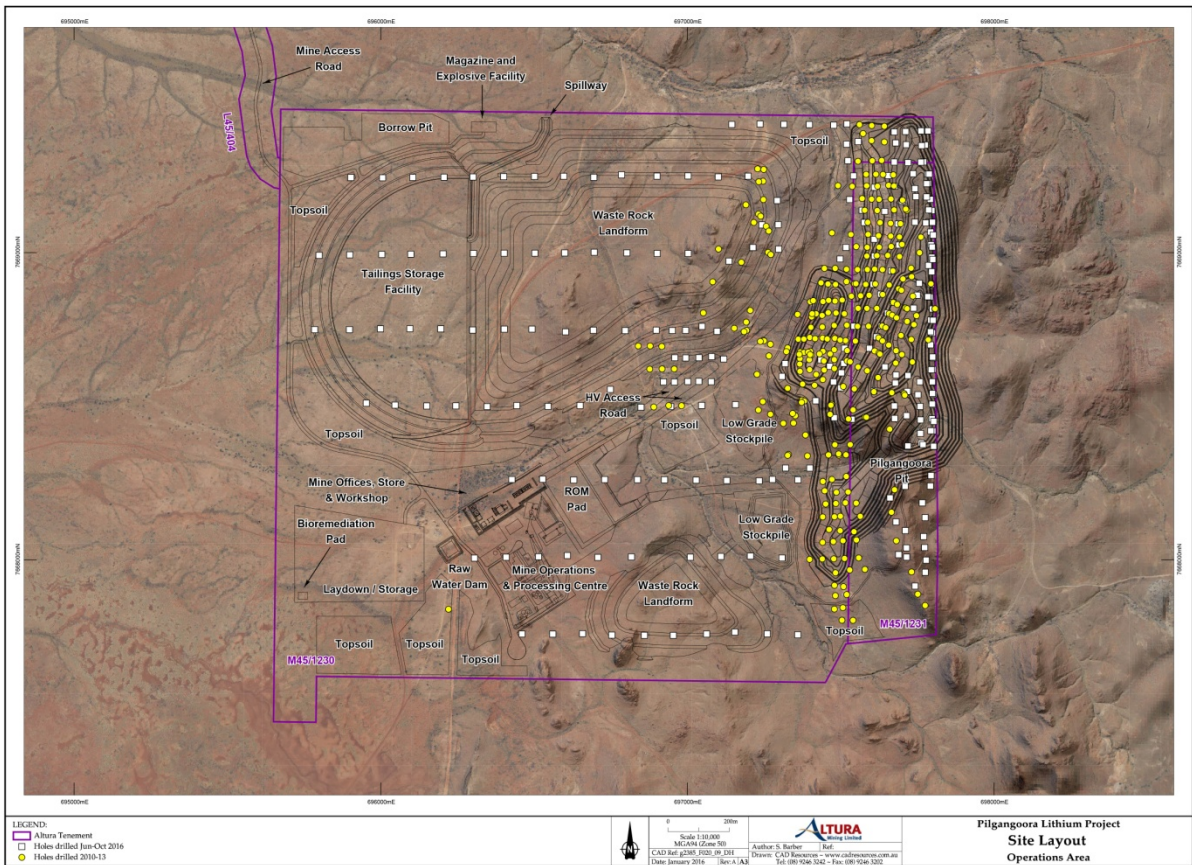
Plan View of Proposed Site Layout in Relation to Completed Drilling
